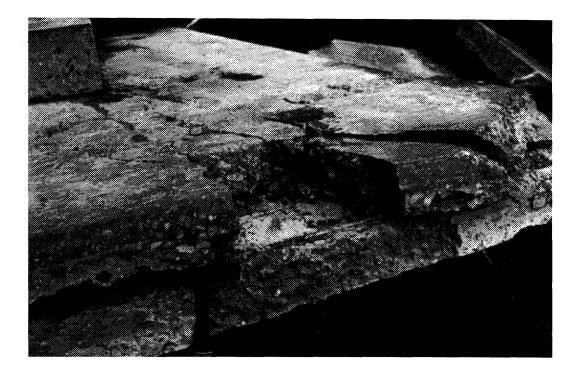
Full-depth pavement removed from distressed area of I-64 in New Kent Co. Pavement delaminated at reinforcement.
